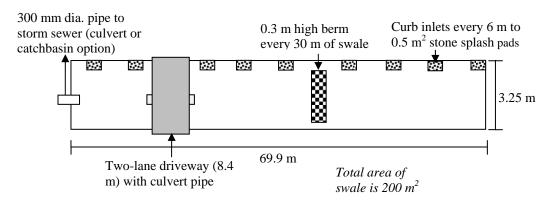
Plan view of enhanced grass swale. Drainage area is 2000 m<sup>2</sup>
